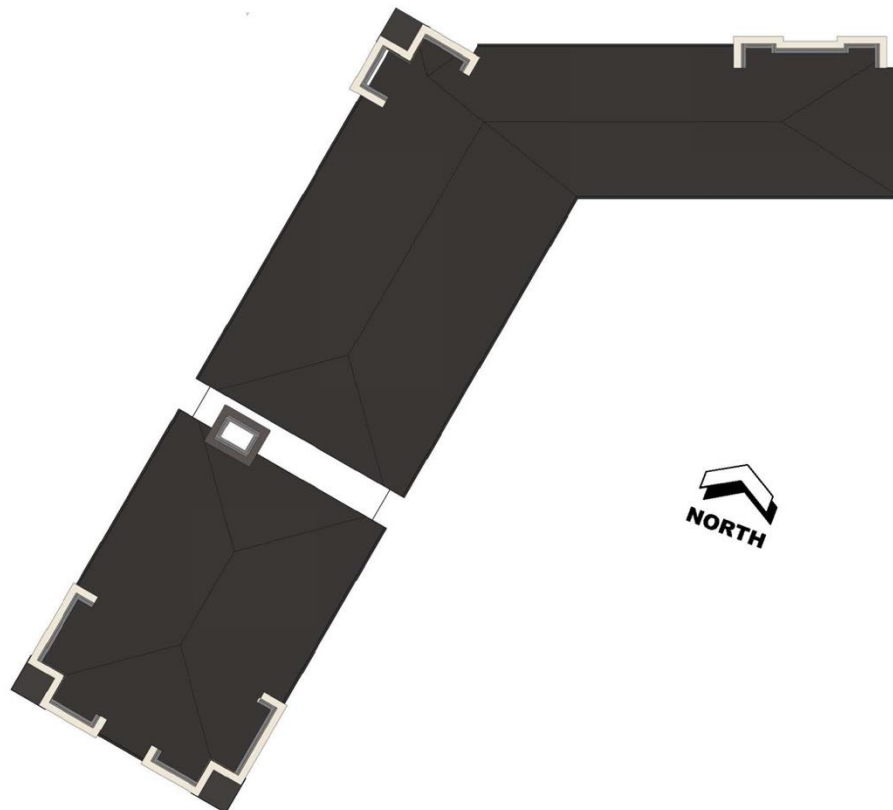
The roof plan of Building B05 (Ryman Drawing A1-030 RC26).
